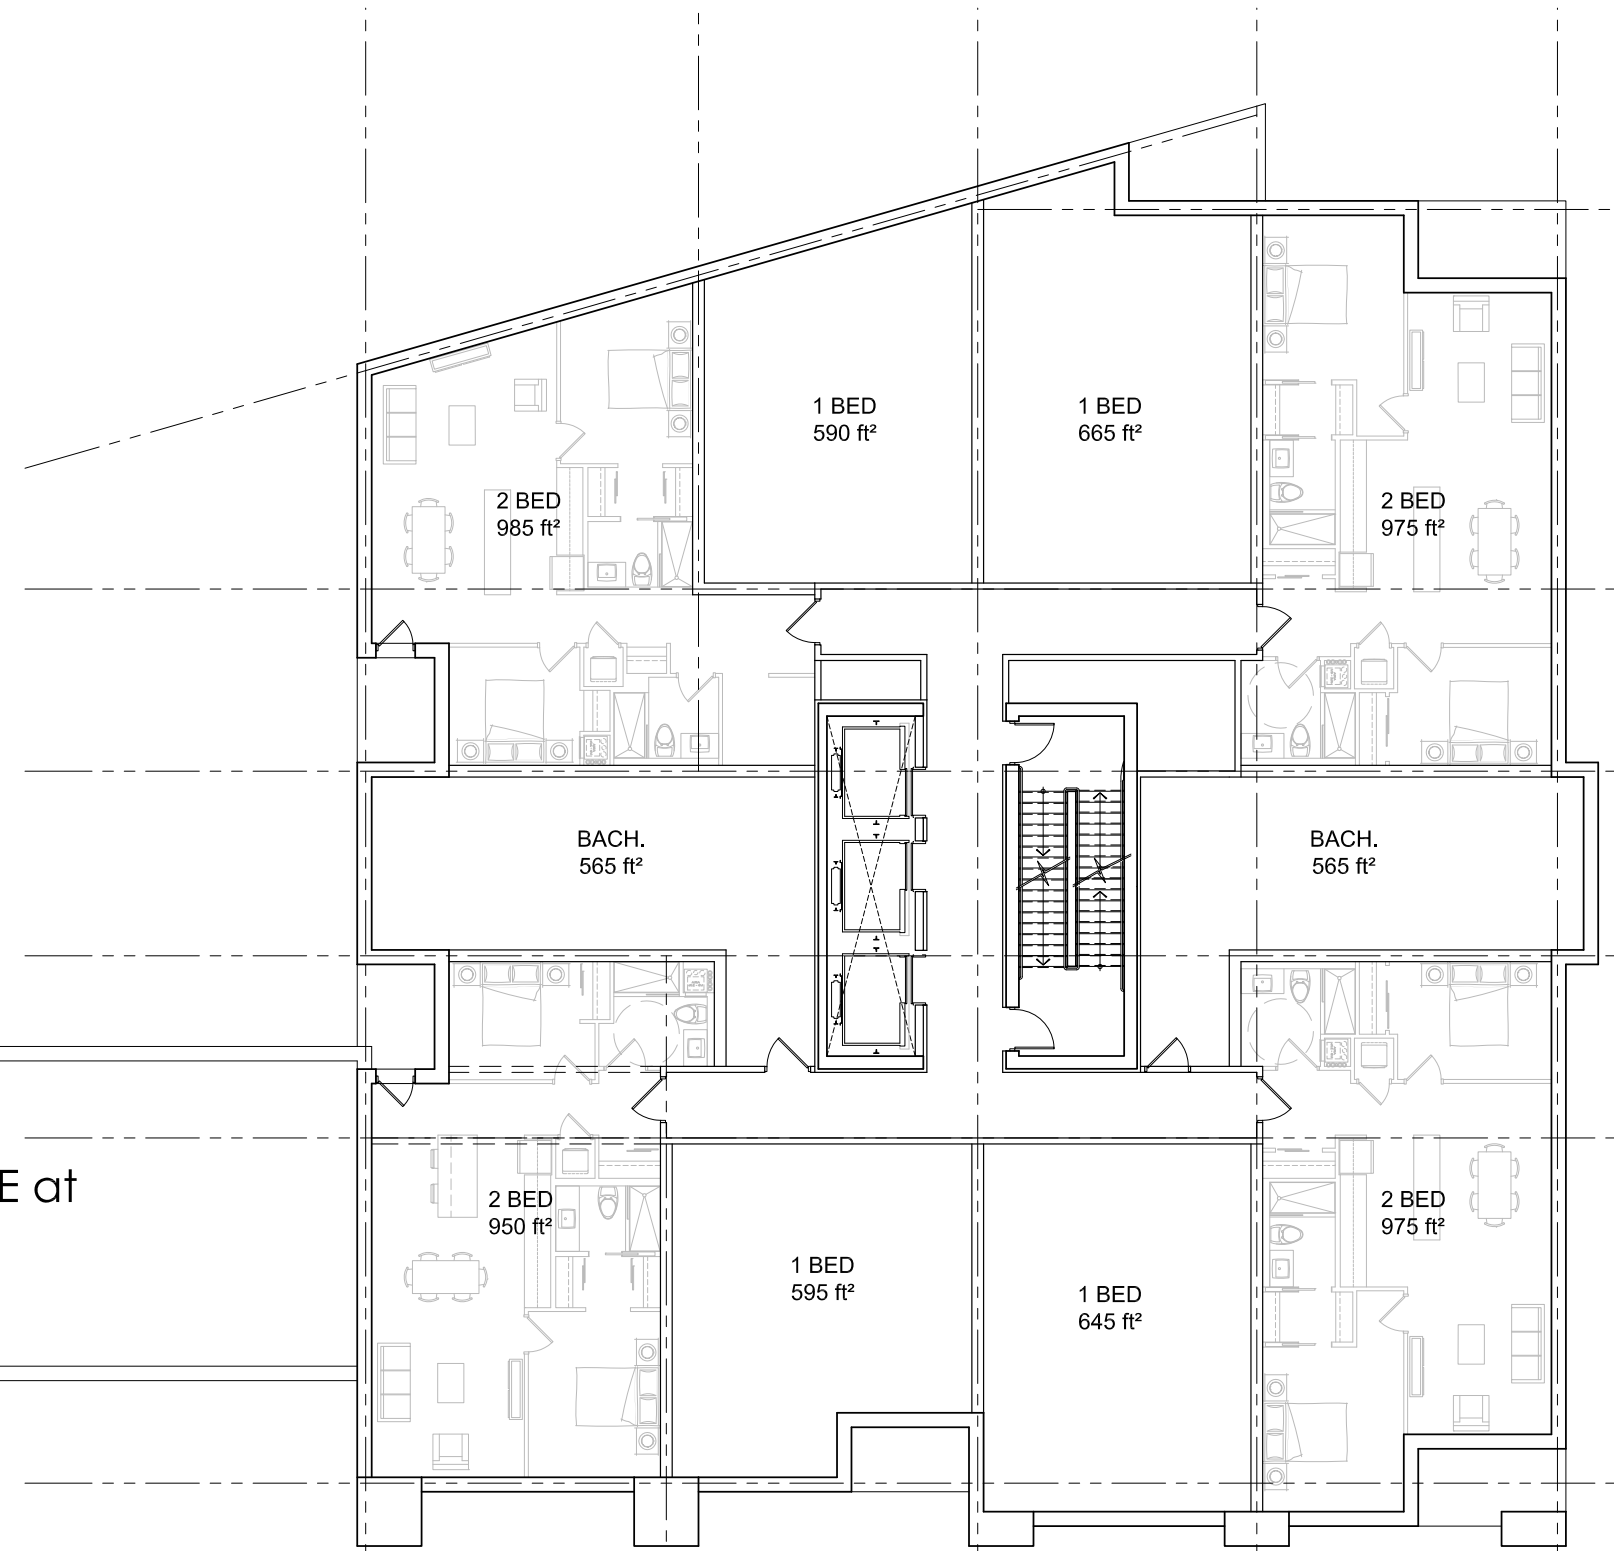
Podium Floor (Floors 2 to 4), Residential Tower 2
